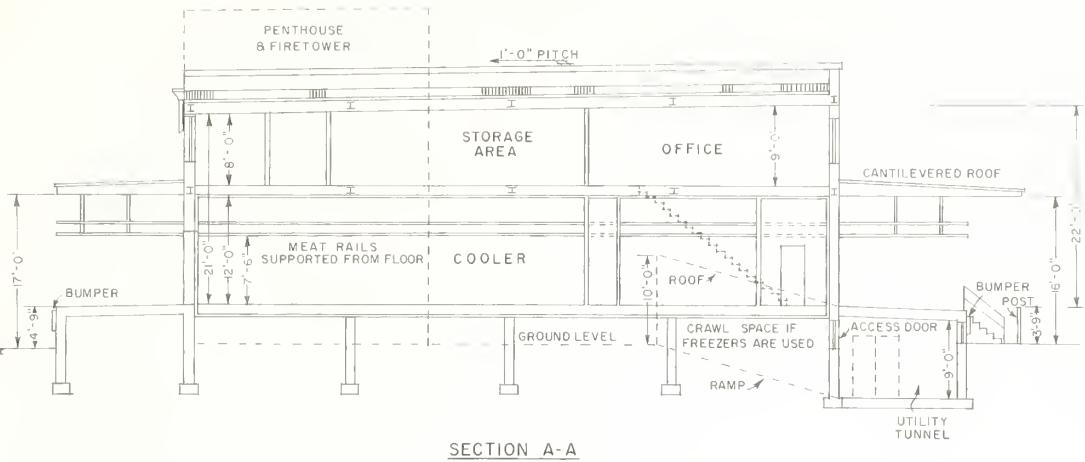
Layout of a meat and meat products unit in a multiple-occupancy building. *Note:* The use of a utility tunnel is optional. Without the tunnel, refrigeration equipment could be located on the roof and utility lines along walls inside the building.
